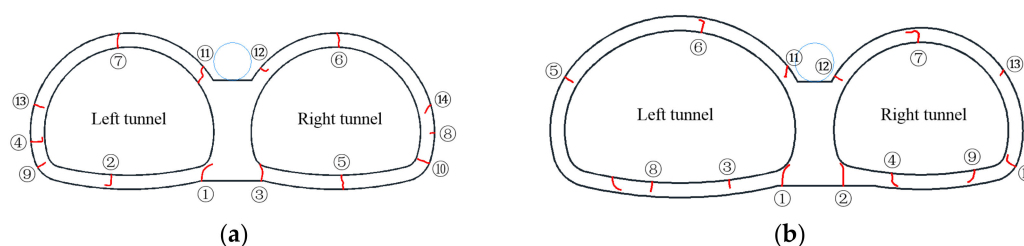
The failure pattern of the double-arch tunnels without voids behind the lining: (a) Symmetrical double-arch tunnel and (b) asymmetrical double-arch tunnel.
